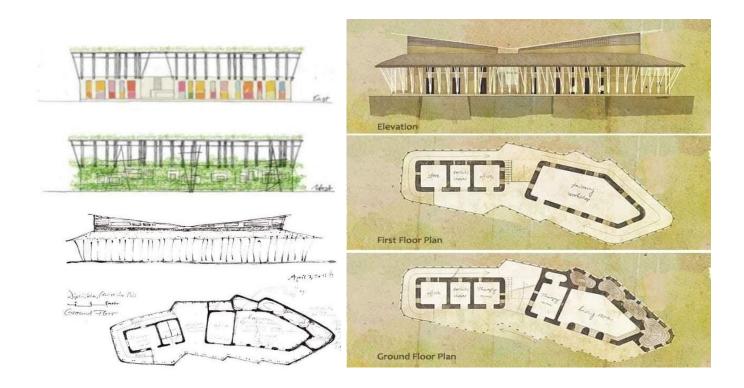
Plan, elevation & sketches of Dipshikha school. Photo Source: archdaily.com
